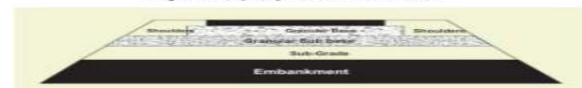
Typical Cross Section of Road Showing the Required Pavement Composition as per IRC Guidelines
